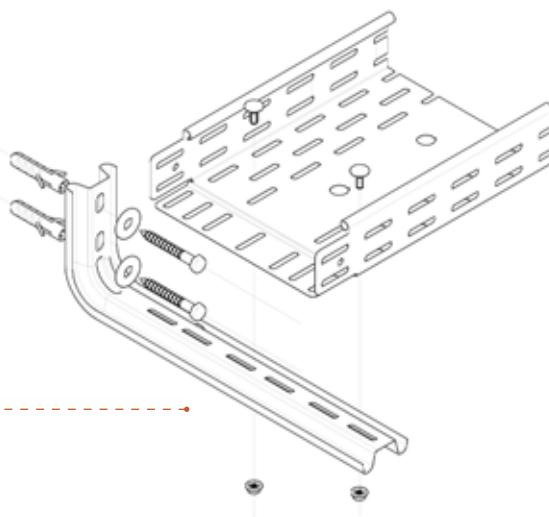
Example of the installation of the cable tray onto the wall of the building with the NKP-SNL/OMEGA bracket
